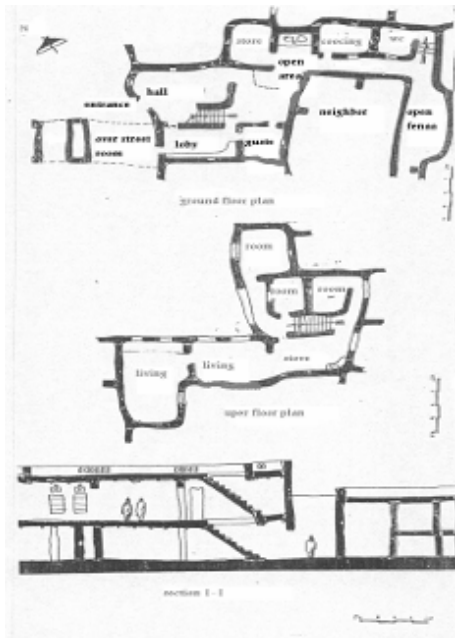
"Abdullah and his brother Abdulkader house in Al-Qasr (ground floor, upper floor and section) with a room spanning the street. (Hamad 1996)
